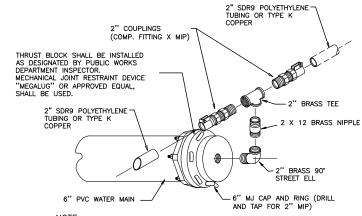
DETAIL "A" TEST RISER ASSEMBLY CONNECTION
